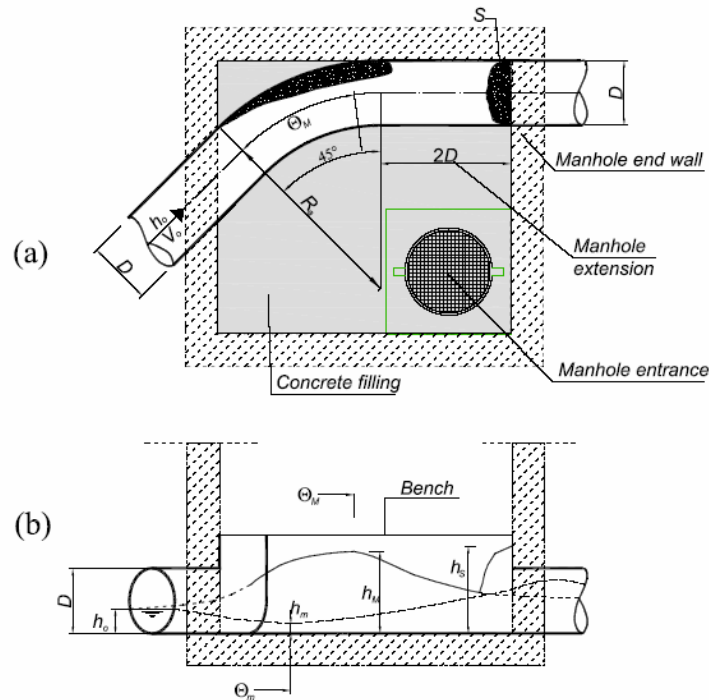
Improved bend manhole with bend extension (a) Plan, (b) Section
